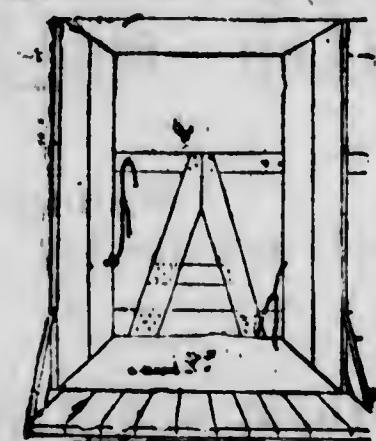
SECTION OF STABLES. Four inches wide; a back five feet from the manger; a trench, eight inches deep and sixteen inches wide, was dug, and a trench-box made of twisted plank with tight joints, and the box laid in cement mortar, making it absolutely water-tight. A plank fourteen inches in width was applied to the inner edge of the trench-box, for the hind feet of the cows; the fore feet are on the earth. This shuts out all undercurrents of air, frost and eddies.
